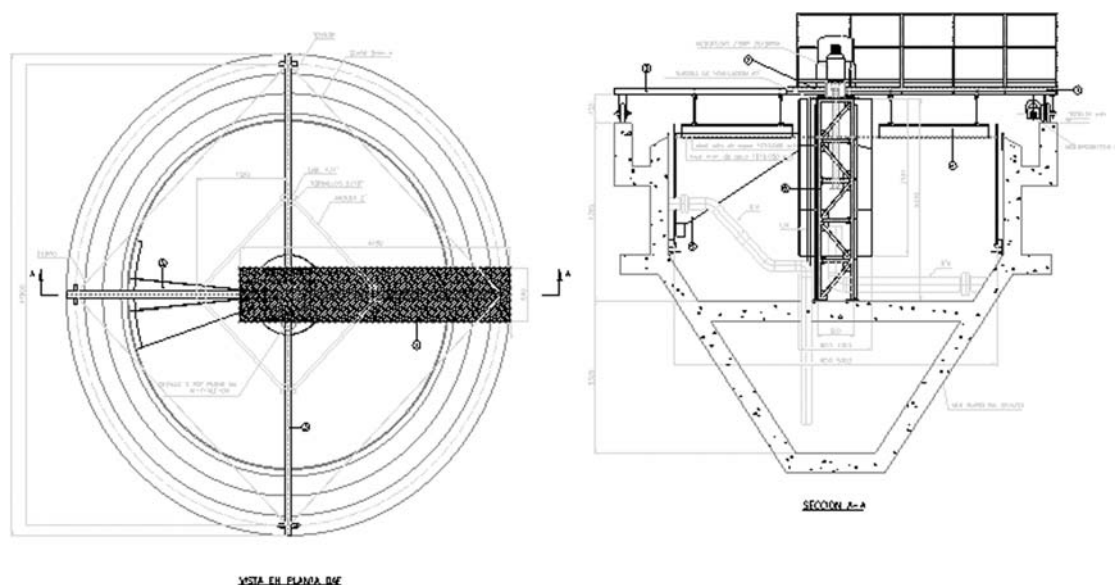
Plan and cross section of a typical diffused air flotation installation
